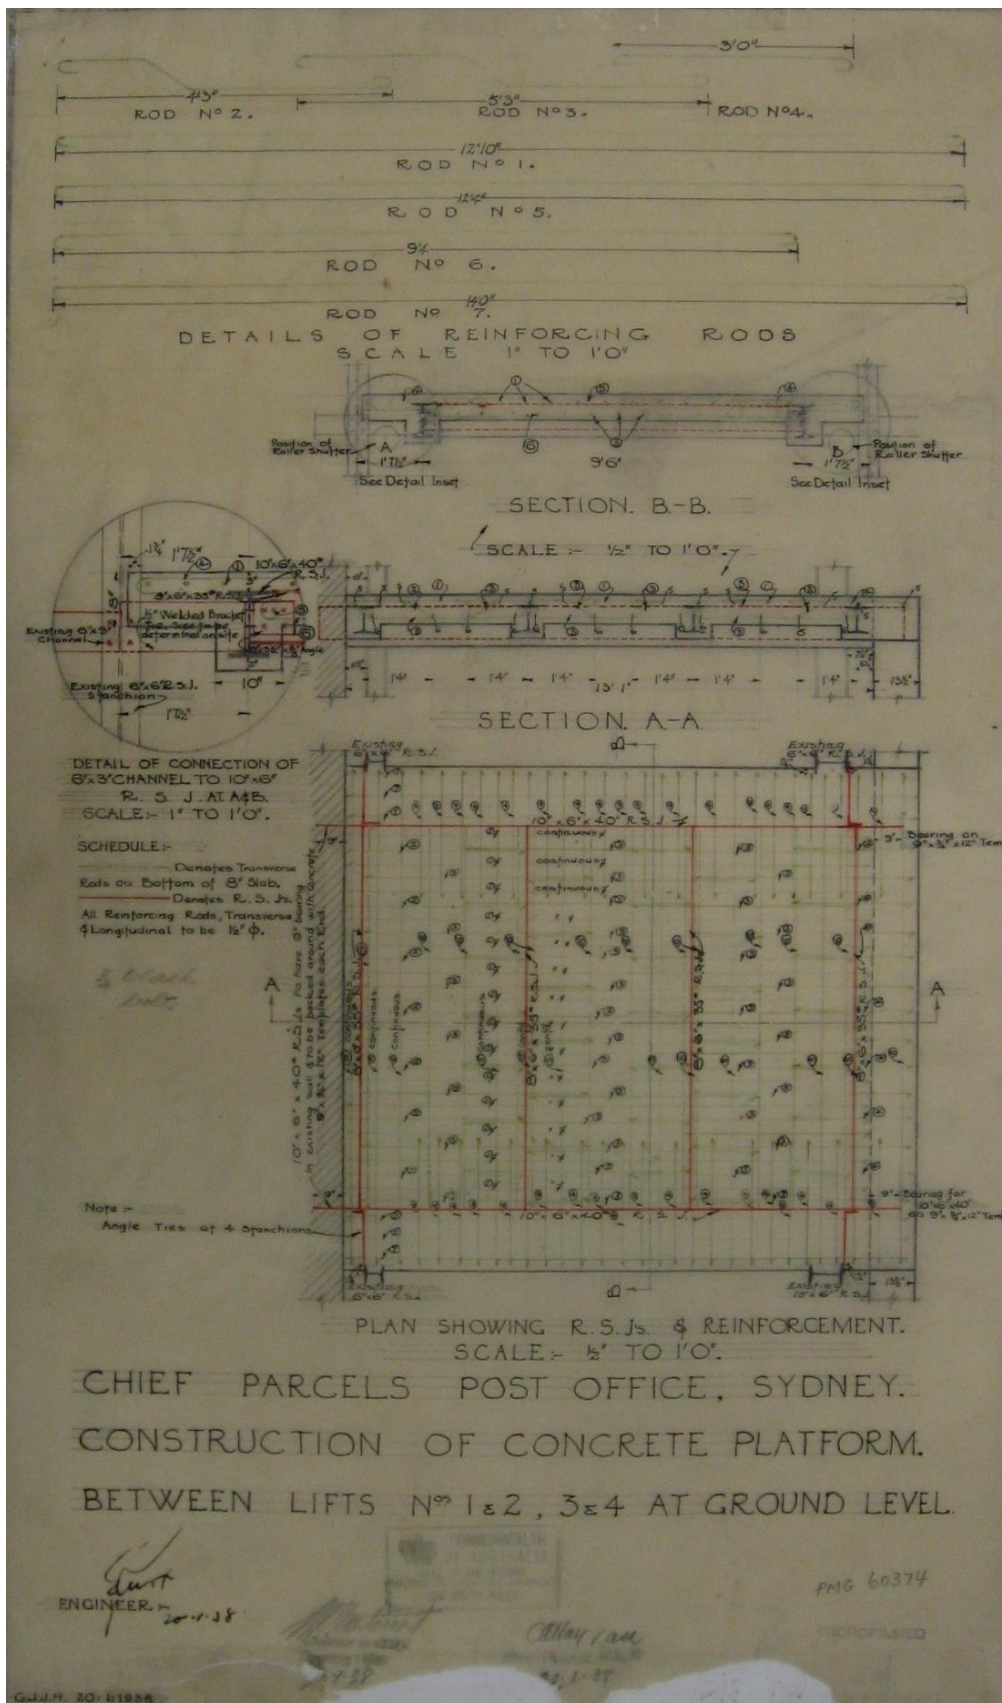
Chief Parcels Post Office, Sydney, construction of concrete platform between lifts Nos 1 & 2, 3 & 4 at ground level, 1958
